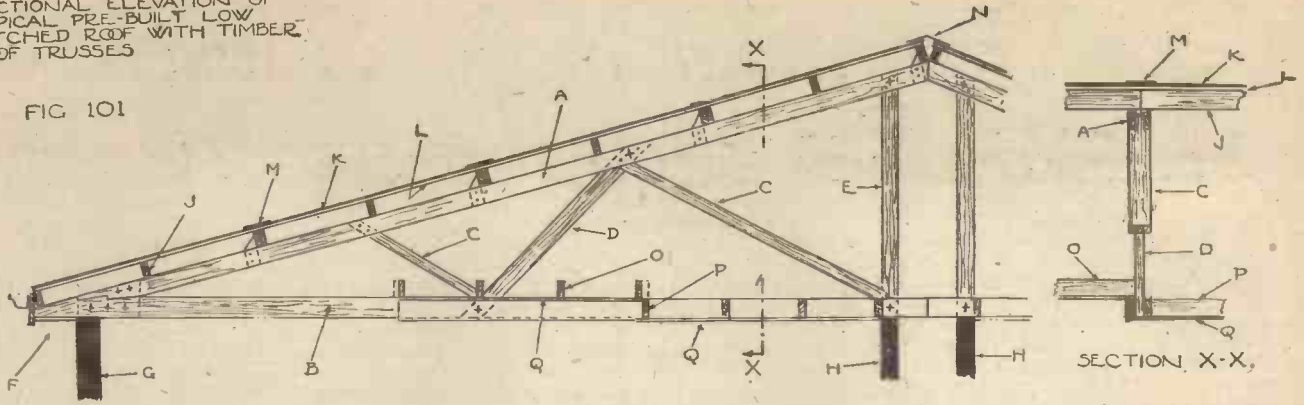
A—Timber principal rafter of twin formation. B—Timber main tie of twin formation. C—Single member strut. D—Single member tie. E—function and binding member. F—Gutter unit. G—External wall. H—Internal load-bearing partition of double type. J—Framing of roof unit. K—Sheet roofing material. L—Roof boarding. M—Watertight joint strip. N—Ridge strip. O—Framing of ceiling unit supported on top of main tie of roof truss. P—Ceiling unit slung down to side of main tie. Q—Ceiling covering.
